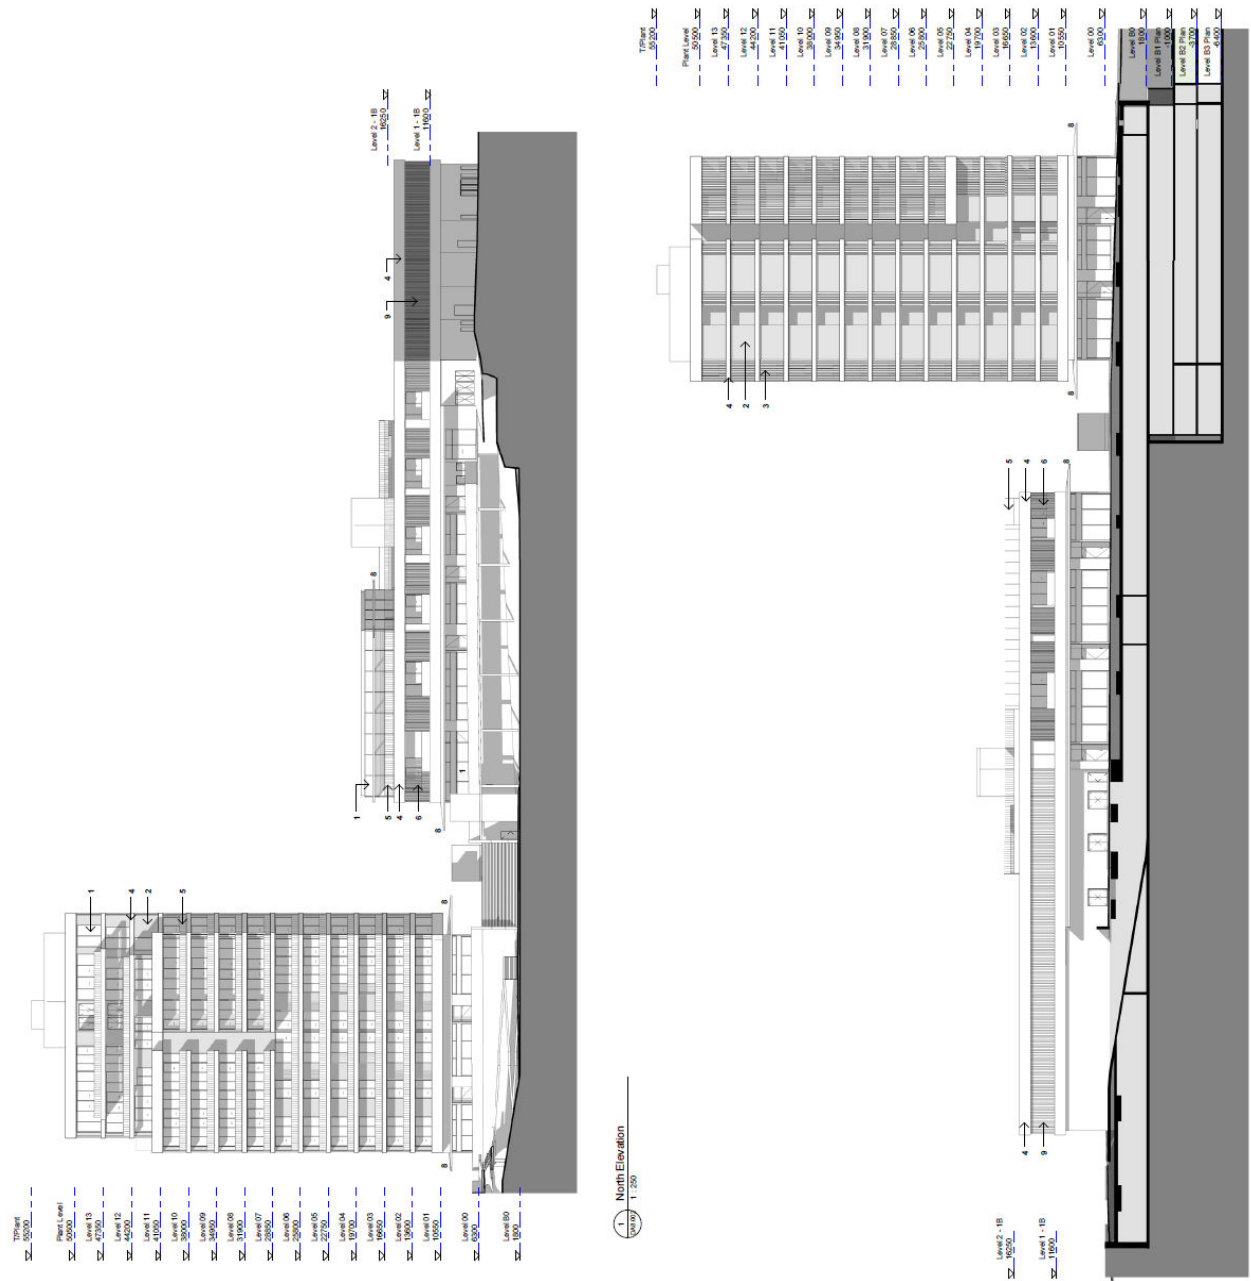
Proposed Stage 1 North Elevation (Source: Bates Smart)
